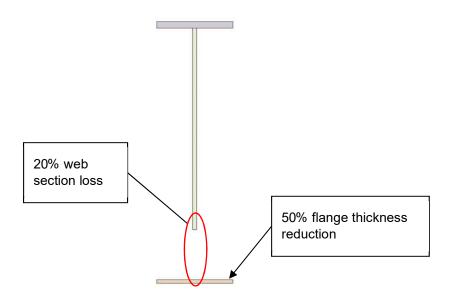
Chain Bridge - Additional Span - Longitudinal Girder - Reduced Section
